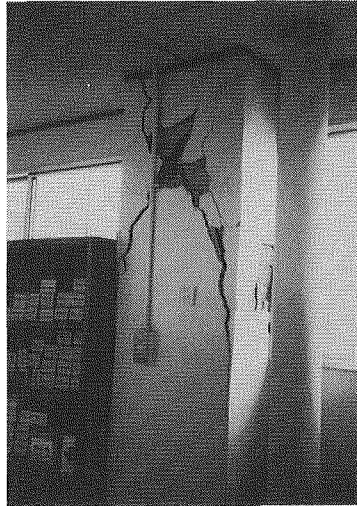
Shear failure of column at the second story. Shear walls had been installed only in the first story after 1968 Tokachi-oki Earthquake.
